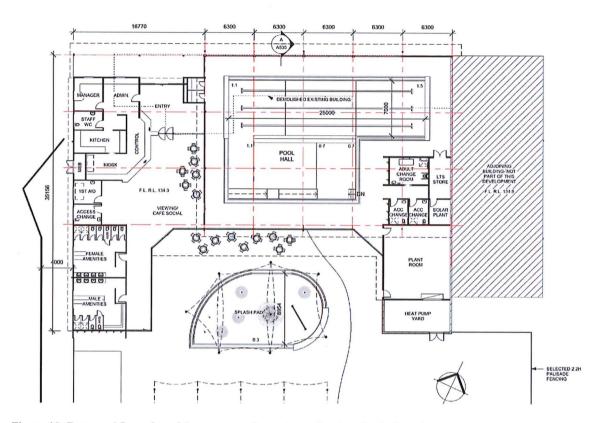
Proposed floor plan of the new aquatic centre and external splash pad
